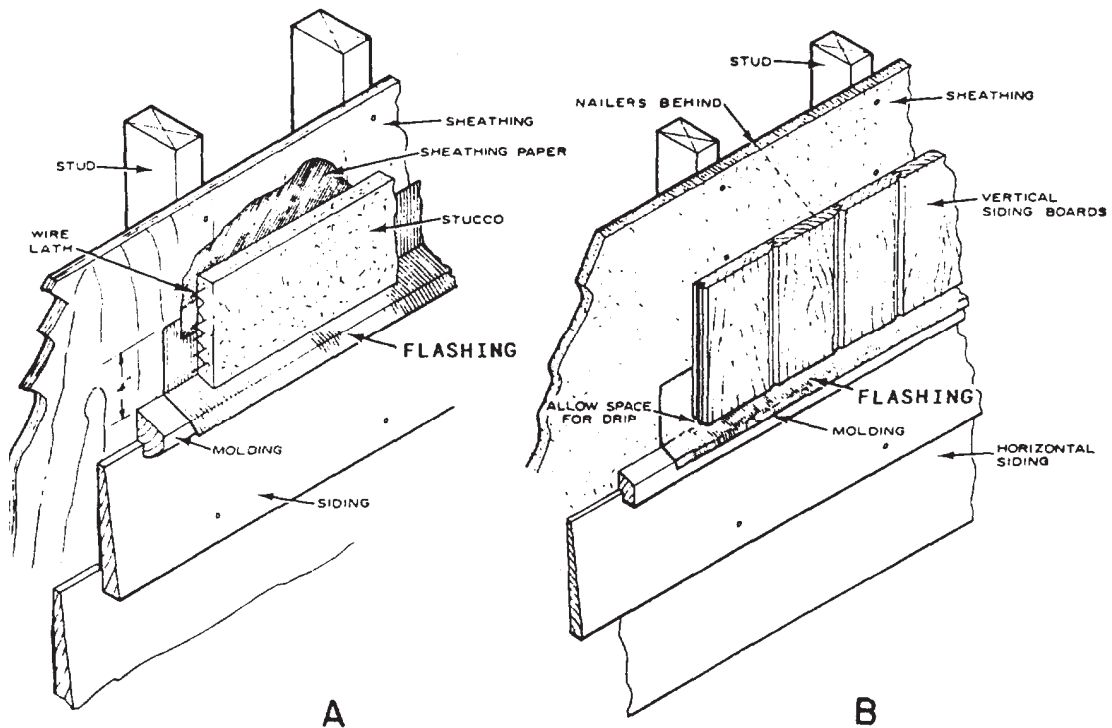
Use of flashing at material changes: A. Stucco above, siding below; B. Vertical siding above, horizontal below,
